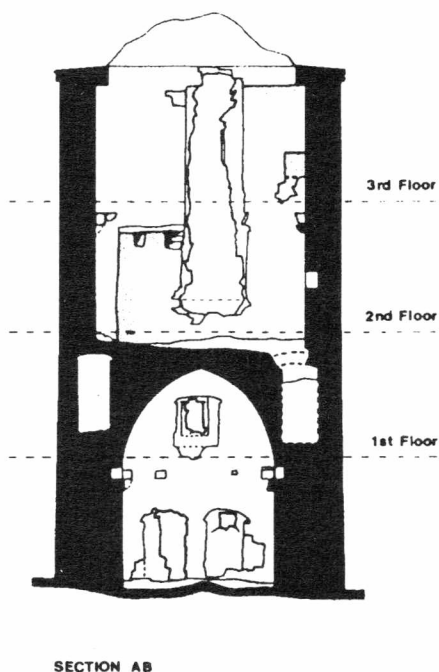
Cross-section, looking north, through Tower House at Dysart
